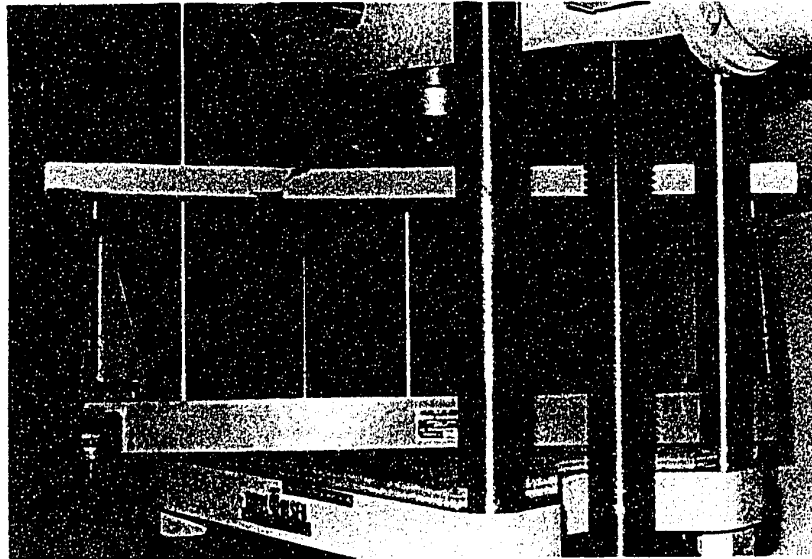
TEST ARRANGEMENT FOR SIMPLY SUPPORTED BEAM
